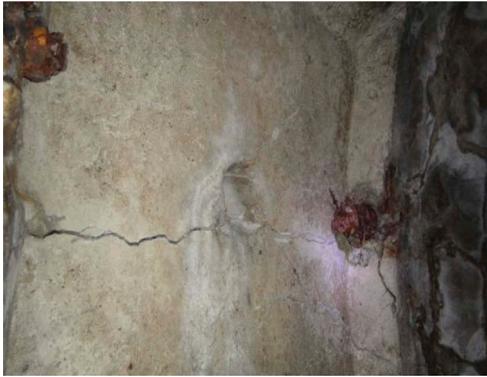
Crack in the concrete of the DG armature upper tubing.
